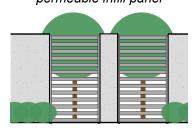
Semi-permeable fencing – 1800mm high brick wall with 1800mm high permeable infill panels
